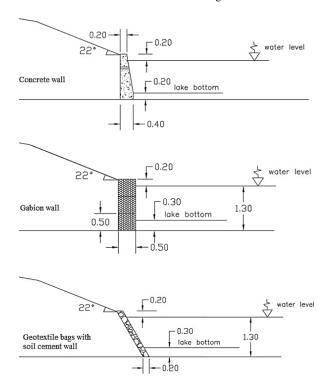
Typical sections of retaining walls: gabion, concrete and geotextile bags with soil cement [3]
